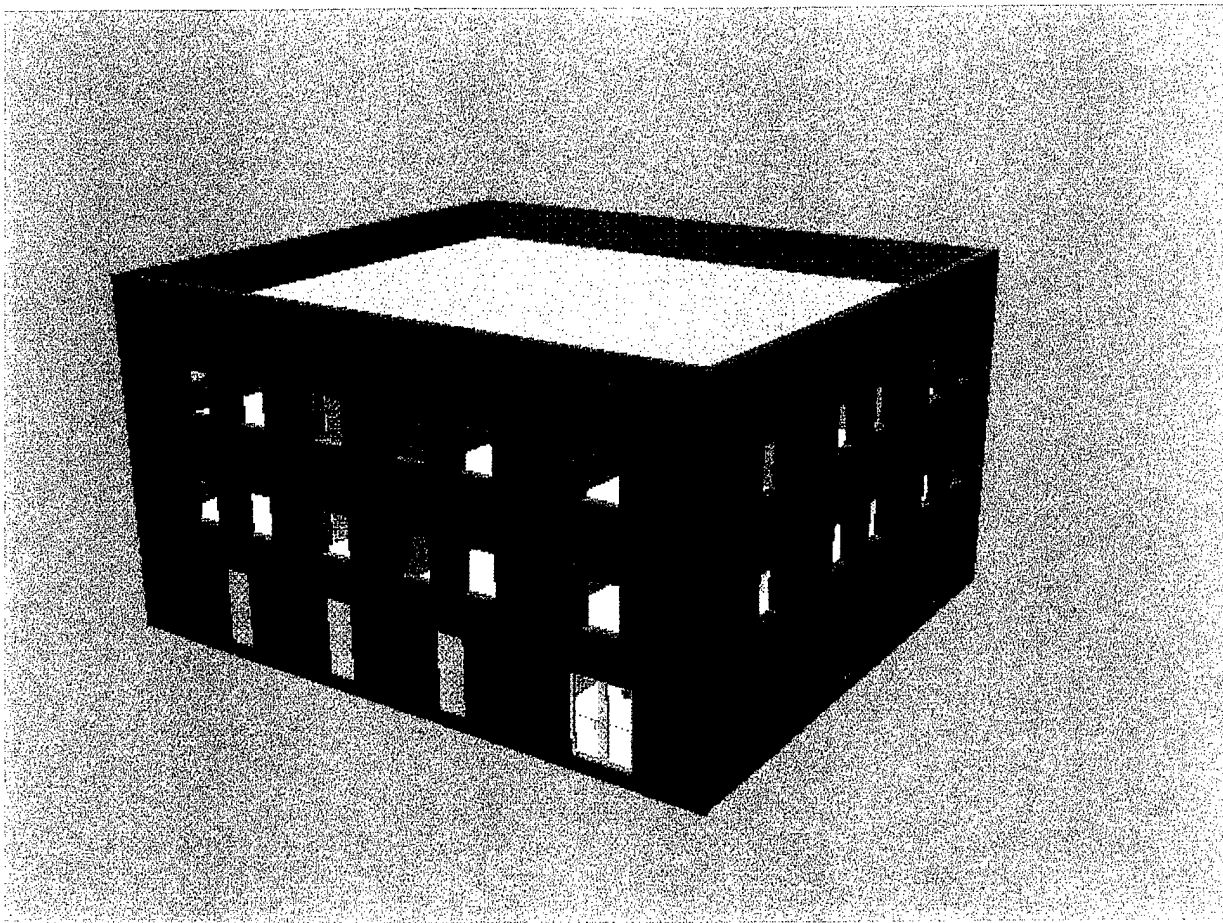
Exterior of McKenna MOUT Site Town Hall Building
